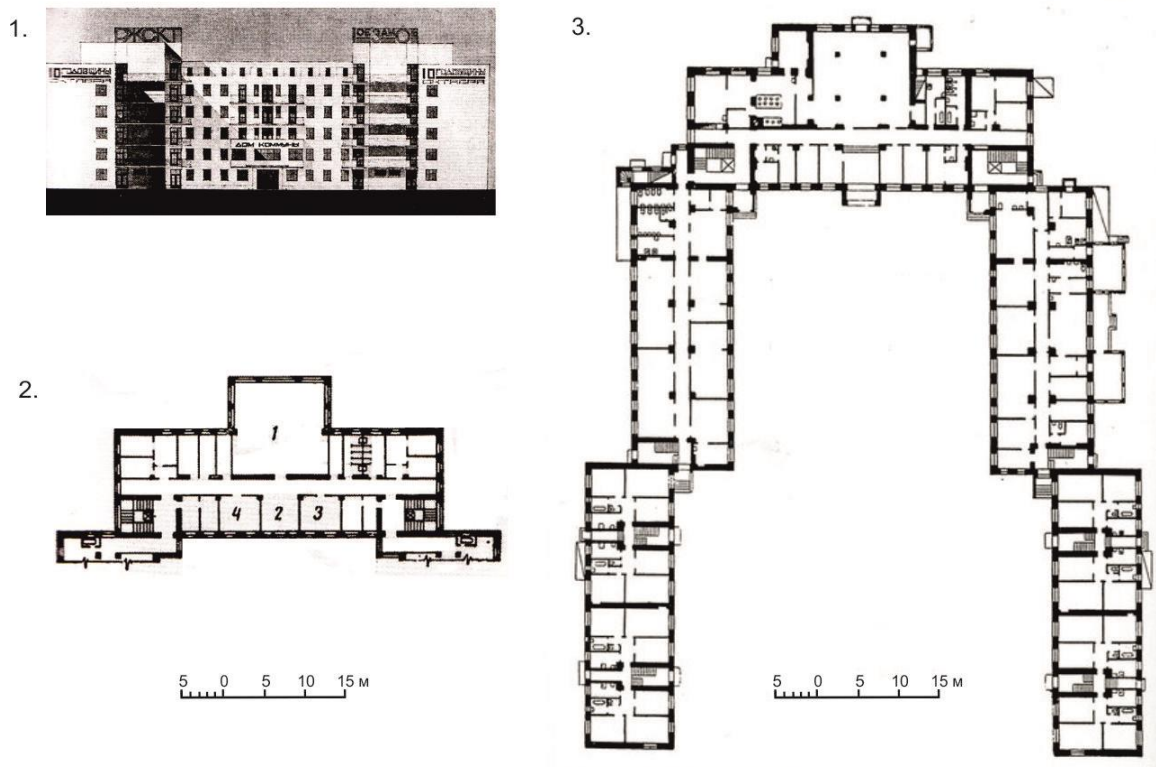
First house commune in Moscow: 1. Façade. 2. Second-floor plan: detail (1 - meeting room, 2, 3, and 4 - library and study rooms) 3. Residential floor plan. [12]
